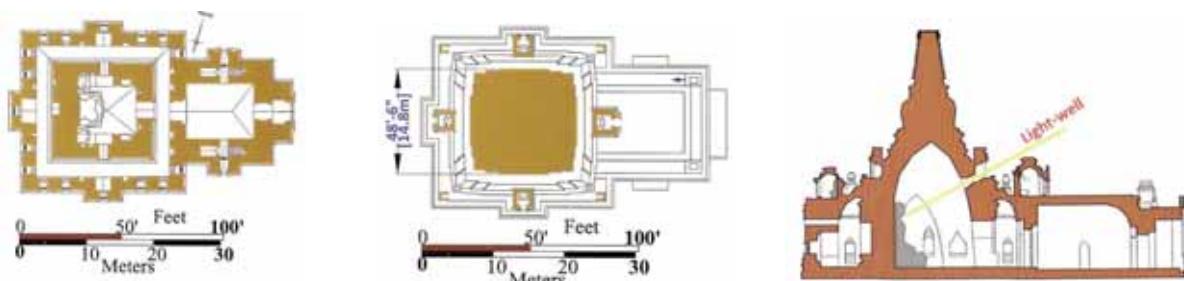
Ground floor plan and upper floor plan of Pa-Hto-Tha-Myar temple
